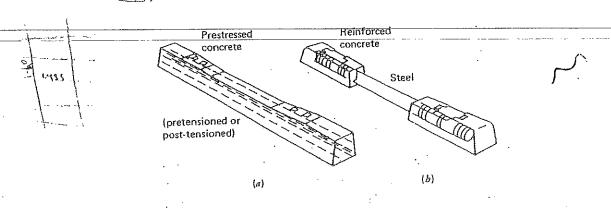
Basic types of concrete sleepers. (Source: Concrete Railway Sleepers, State of the Art Report, Thomas Telford, London, 1987.)
